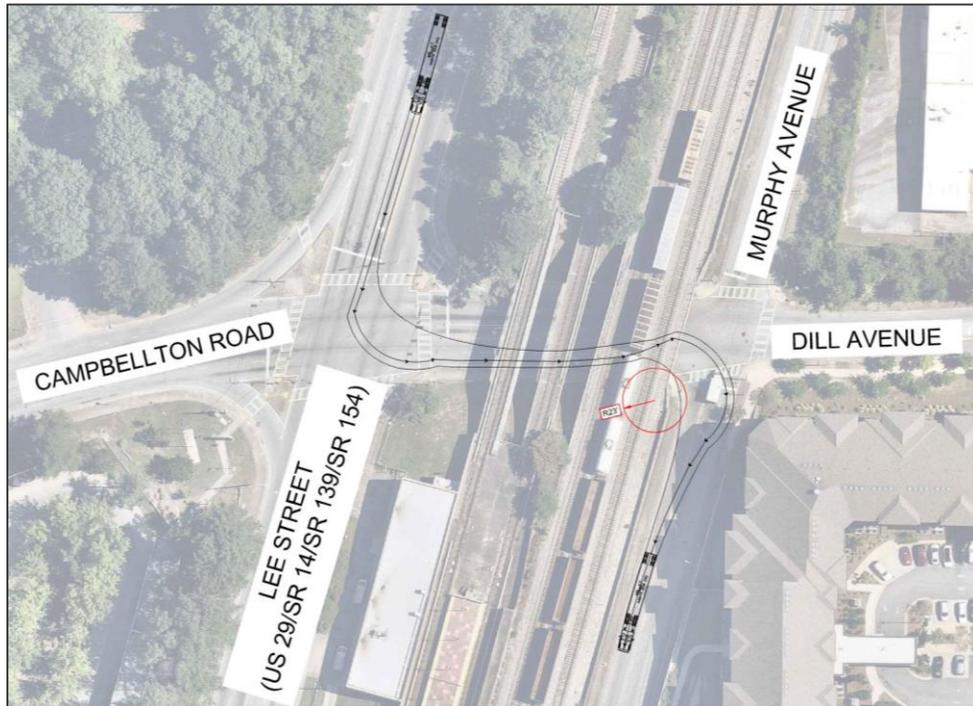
Entering Truck from North on Lee Street (US 29/SR 14/SR 134/SR 159)
